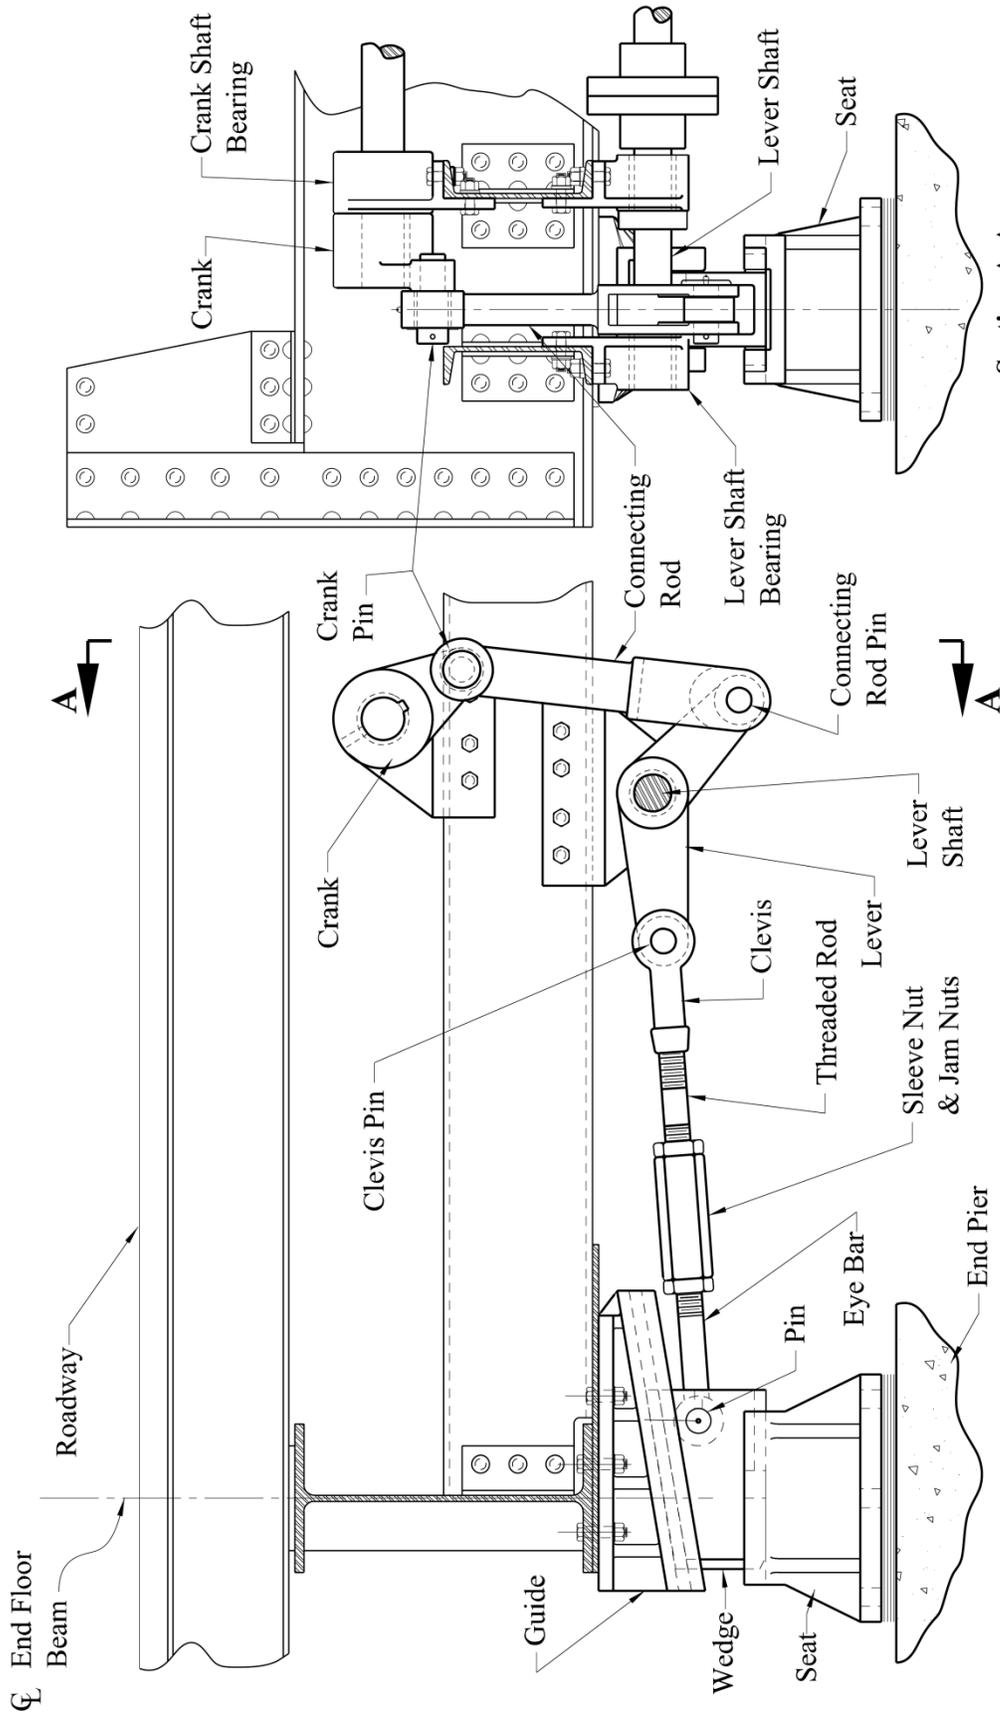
Typical Mechanical End Lift Assembly
